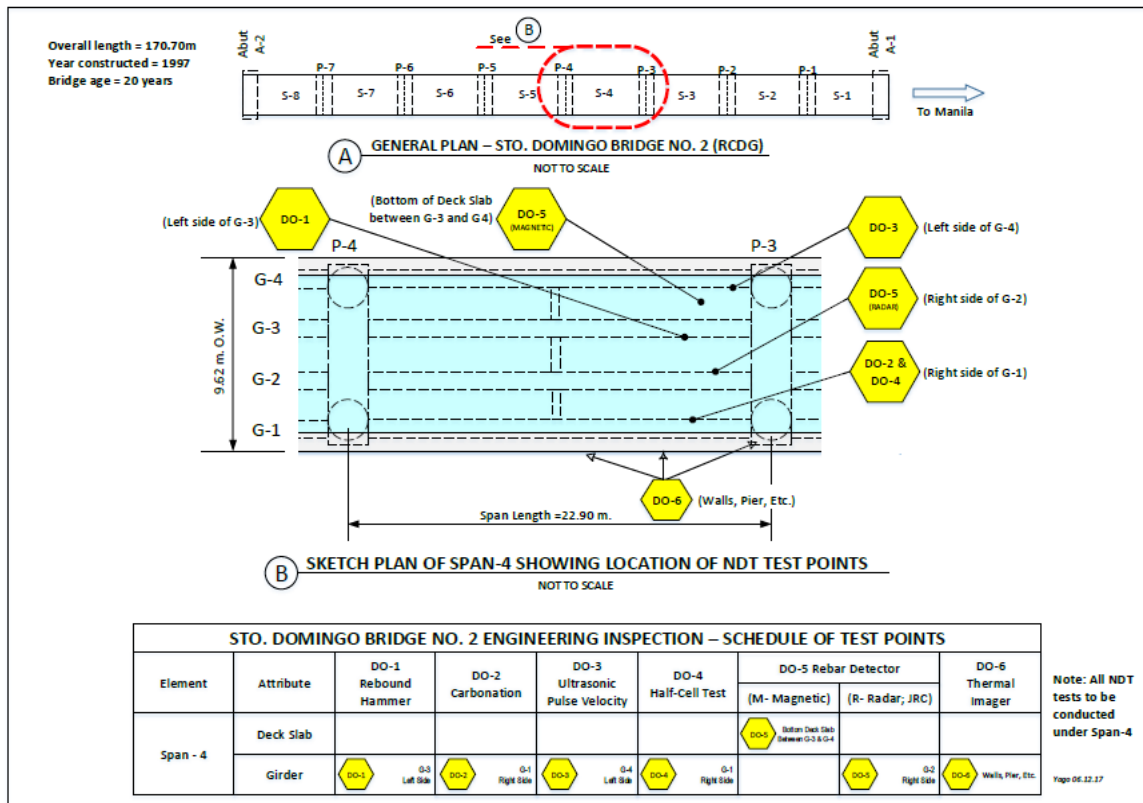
Test Point Location Plan (Luzon Area)
